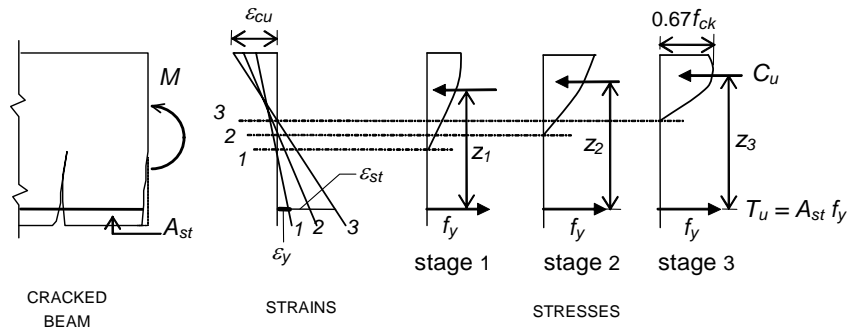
Behaviour of under-reinforced section (tension failure)
